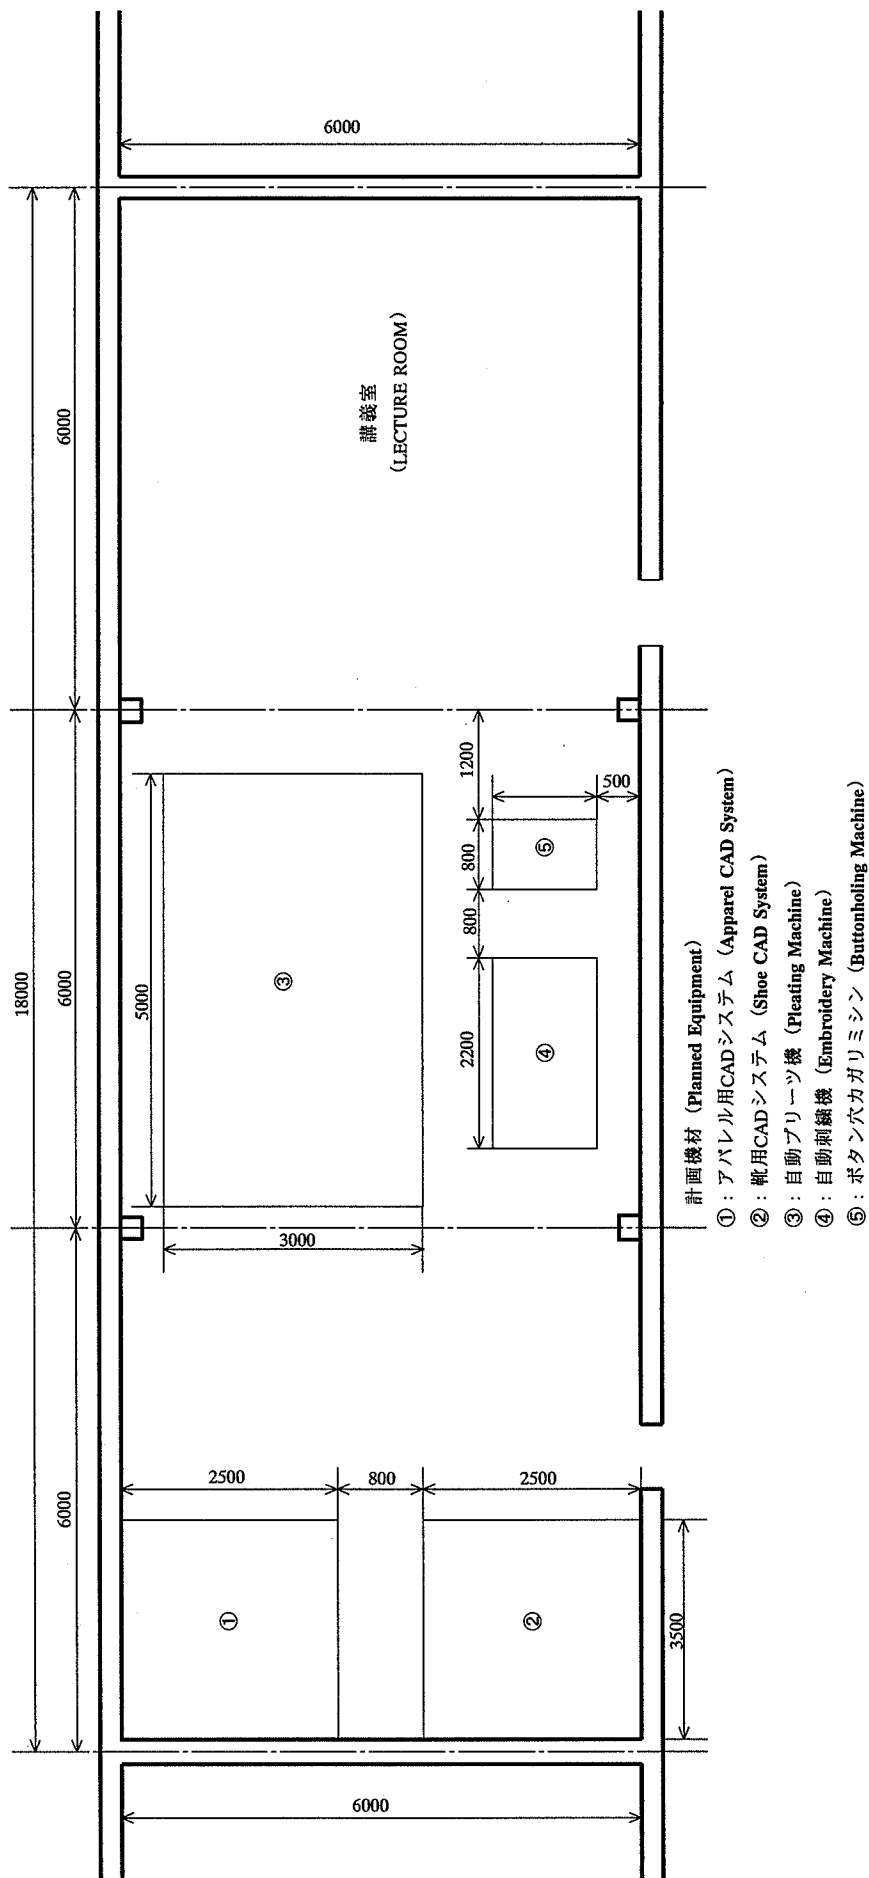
Layout Plan (8) Light Industry Design Lab.
